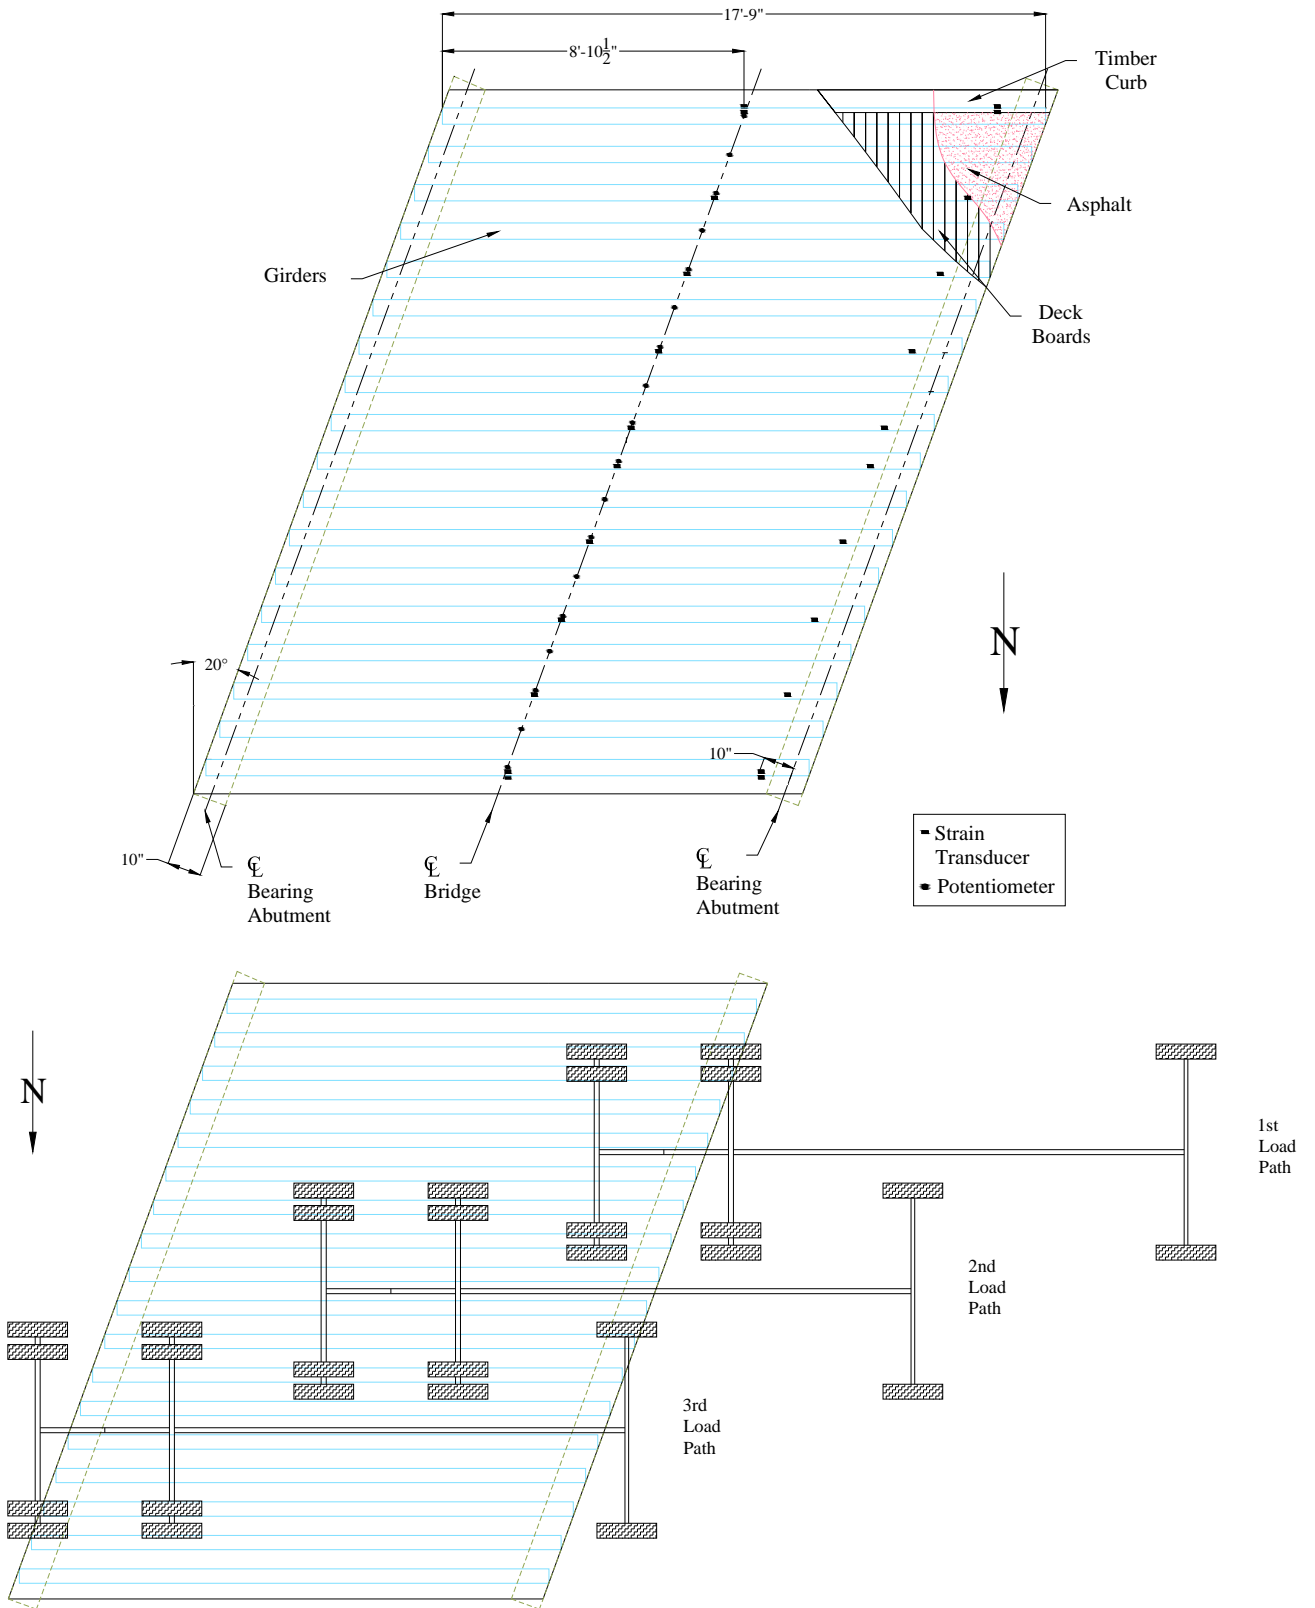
Instrumentation and Load Paths of Bald Creek Bridge
